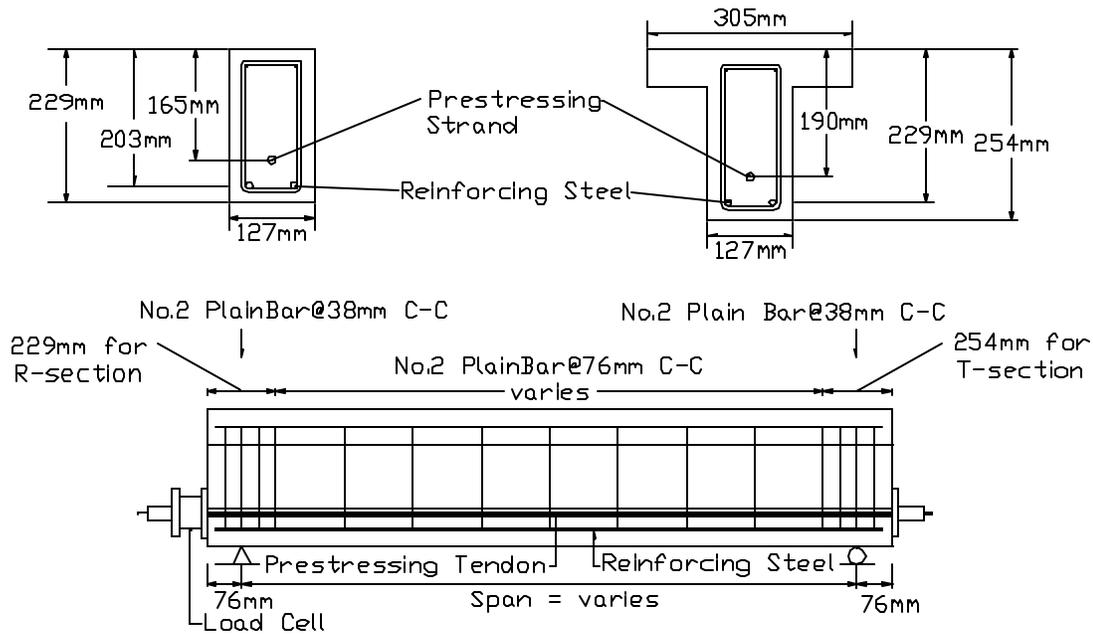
Beam Dimensions and Reinforcing Steel Details
